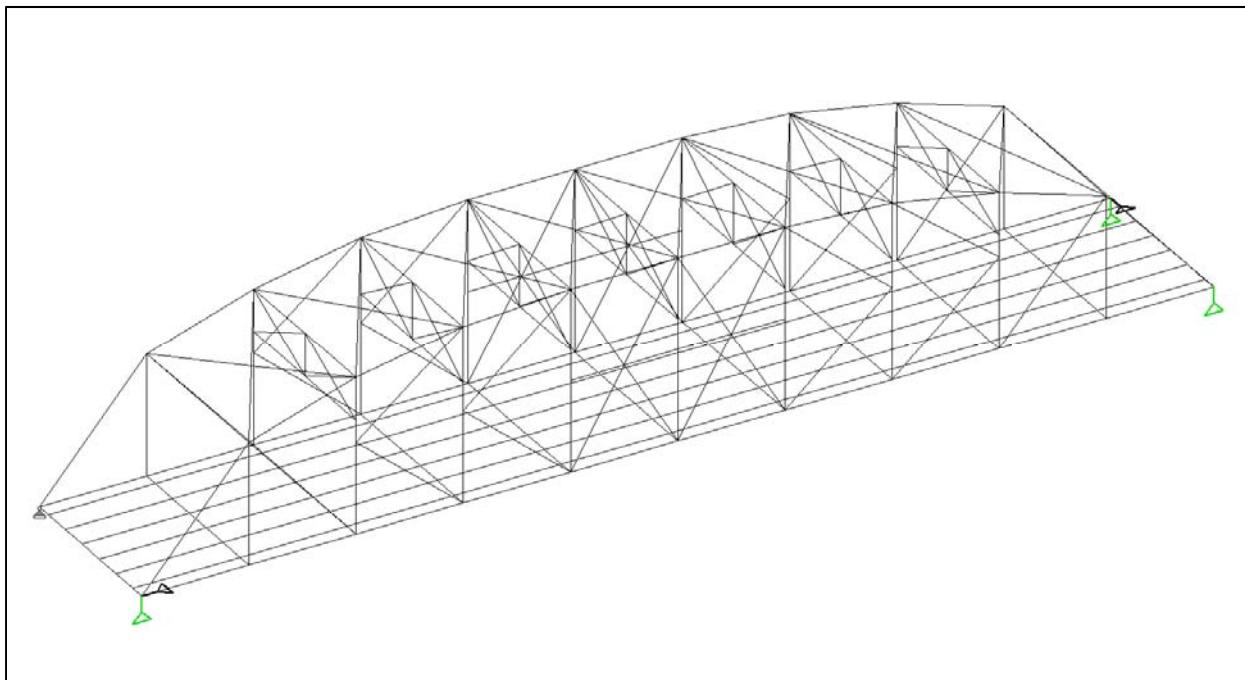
STAAD.Pro Model of Main Through Truss Span
